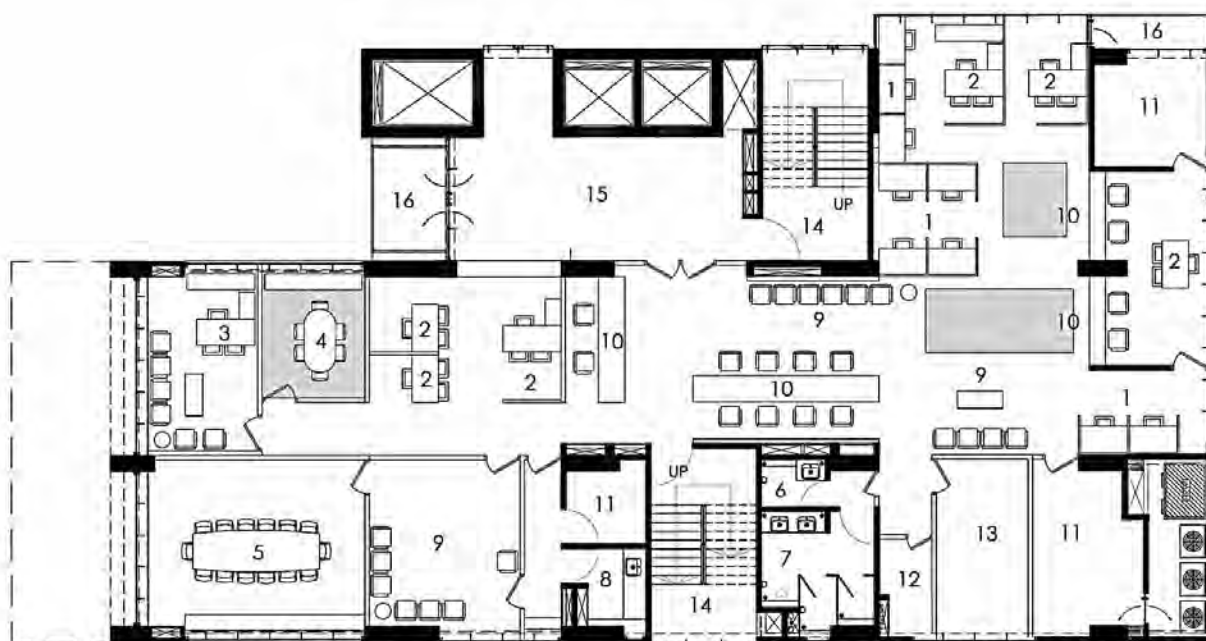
Floor plan of Building B: Middle tier (Source: Building B interior designers, edited by author)
